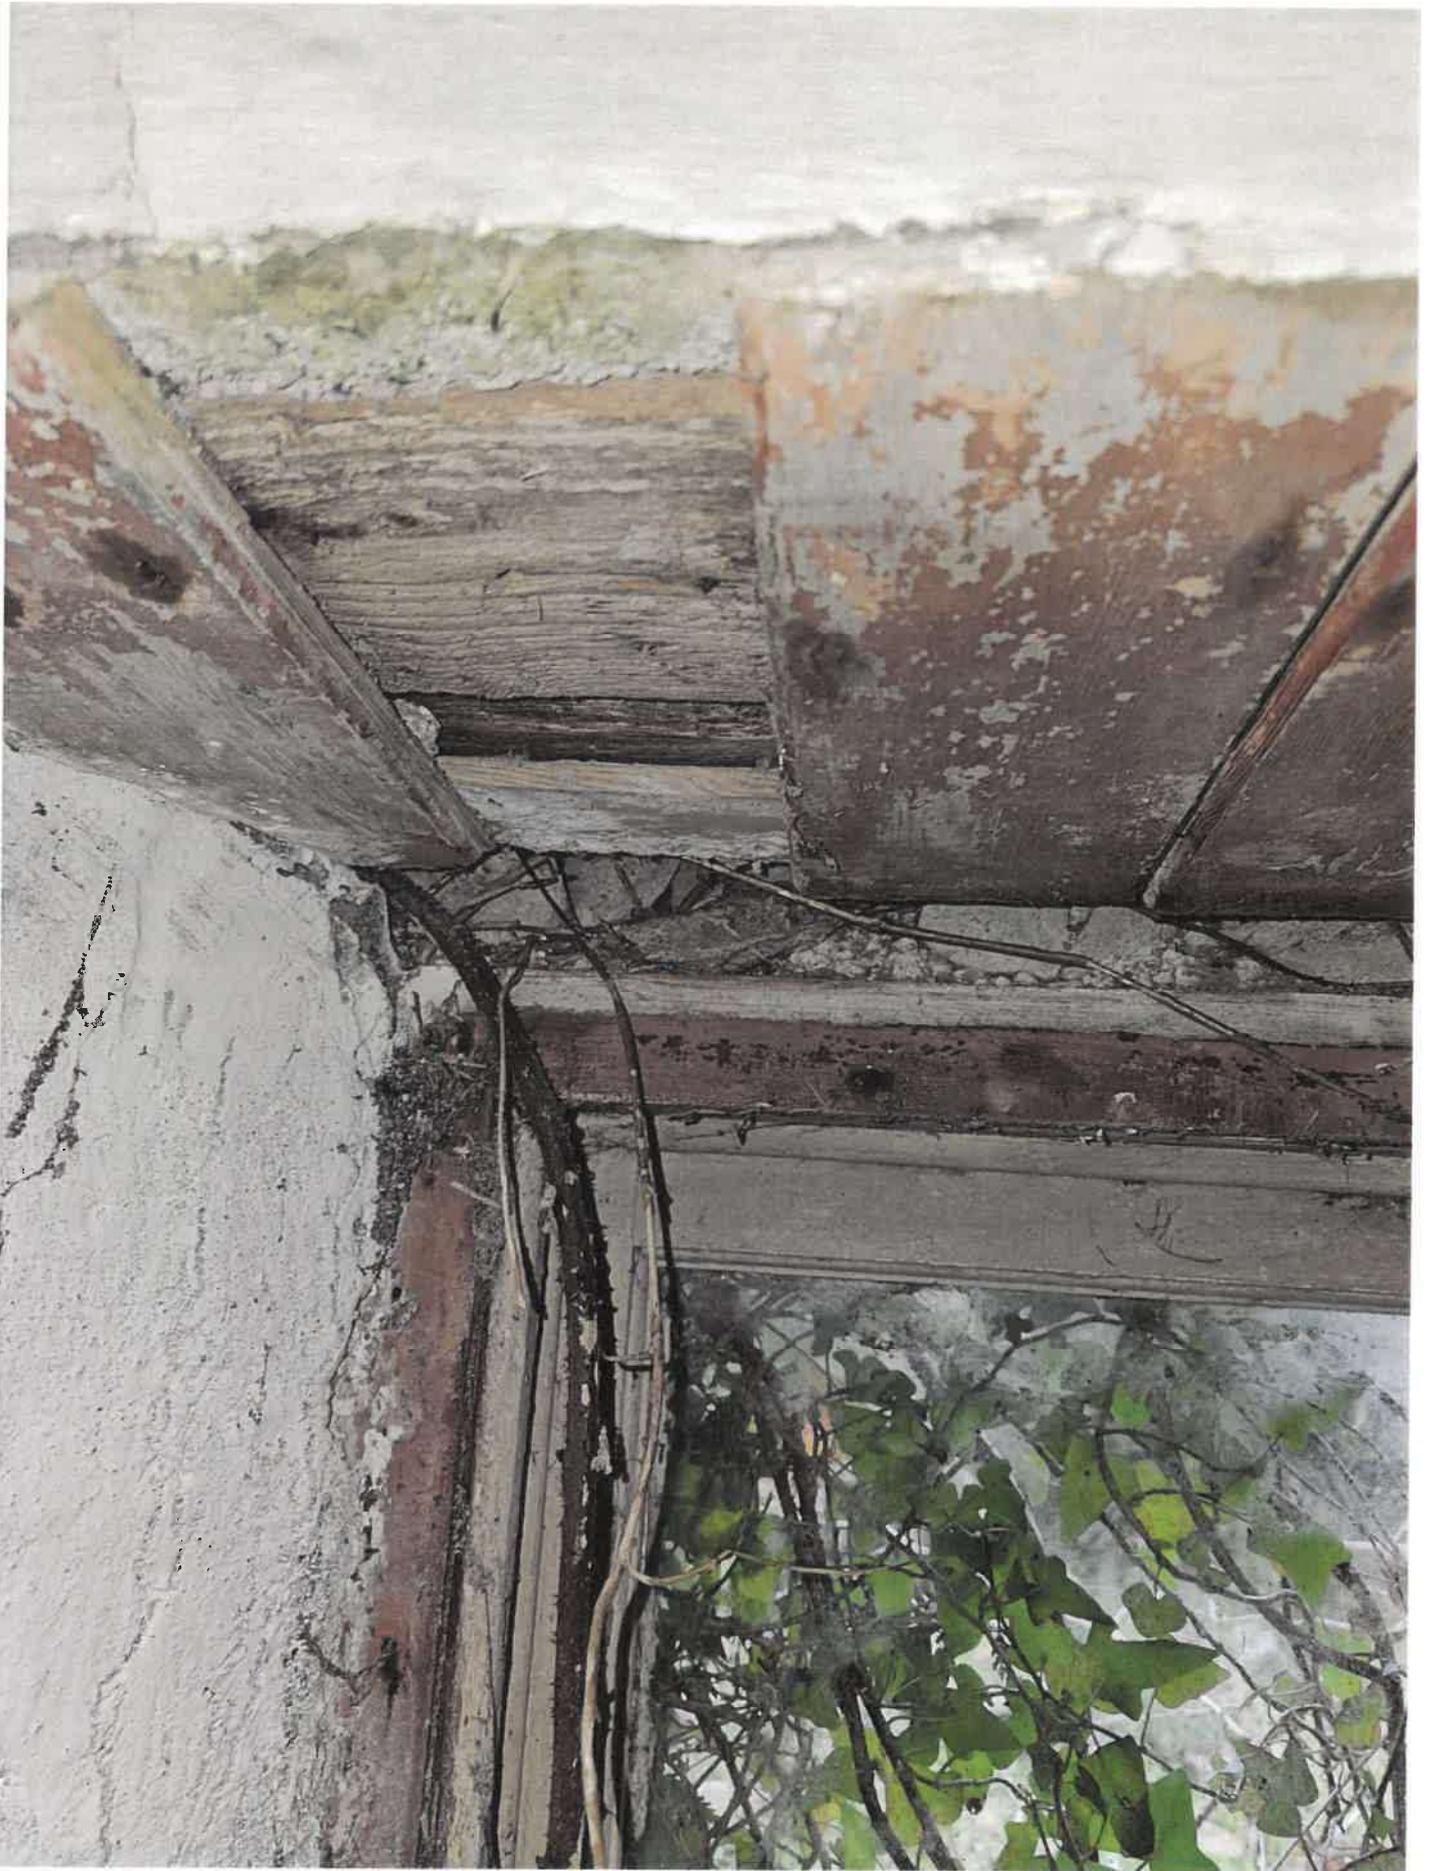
An interior view inside in the dwelling. The door opening on the right-hand side of the photo is the opening between the centre room and right-hand side room, as you look at the front of the dwelling.
